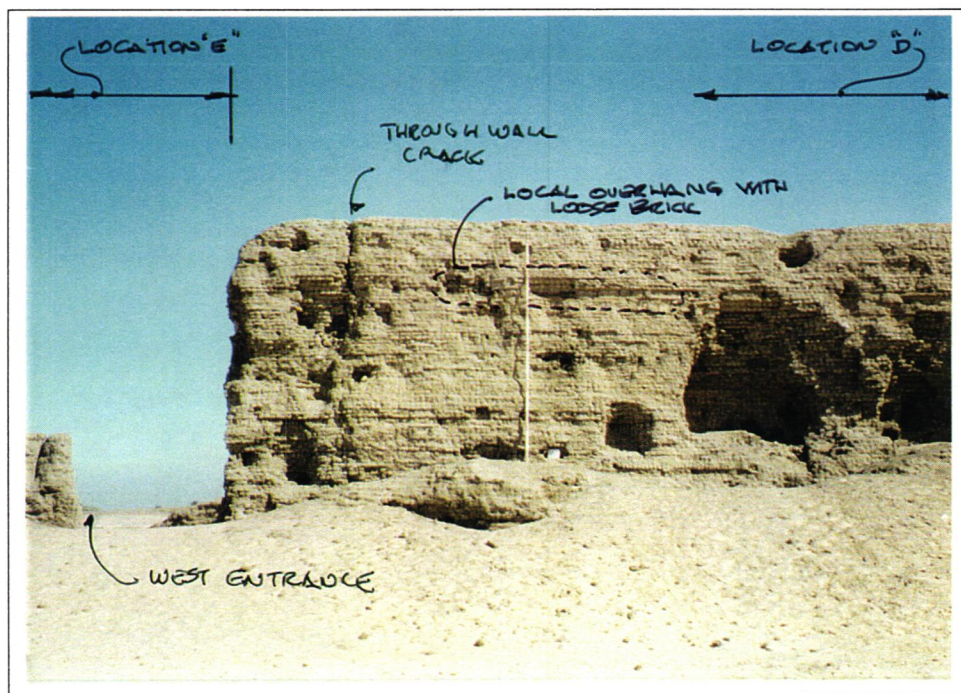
Wall Undercutting West Main Enclosure Wall
